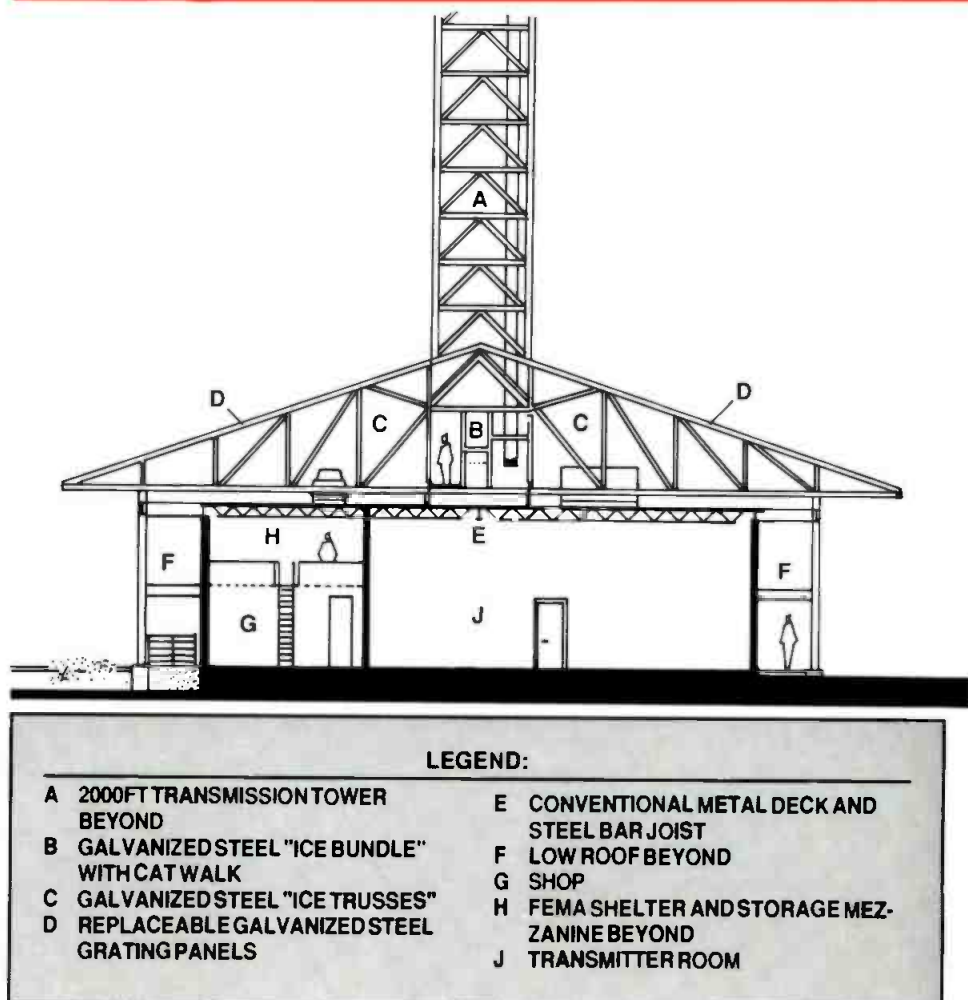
A building plan that shows the various sections of the transmission facility, including steel columns and beams that support roof trusses.
